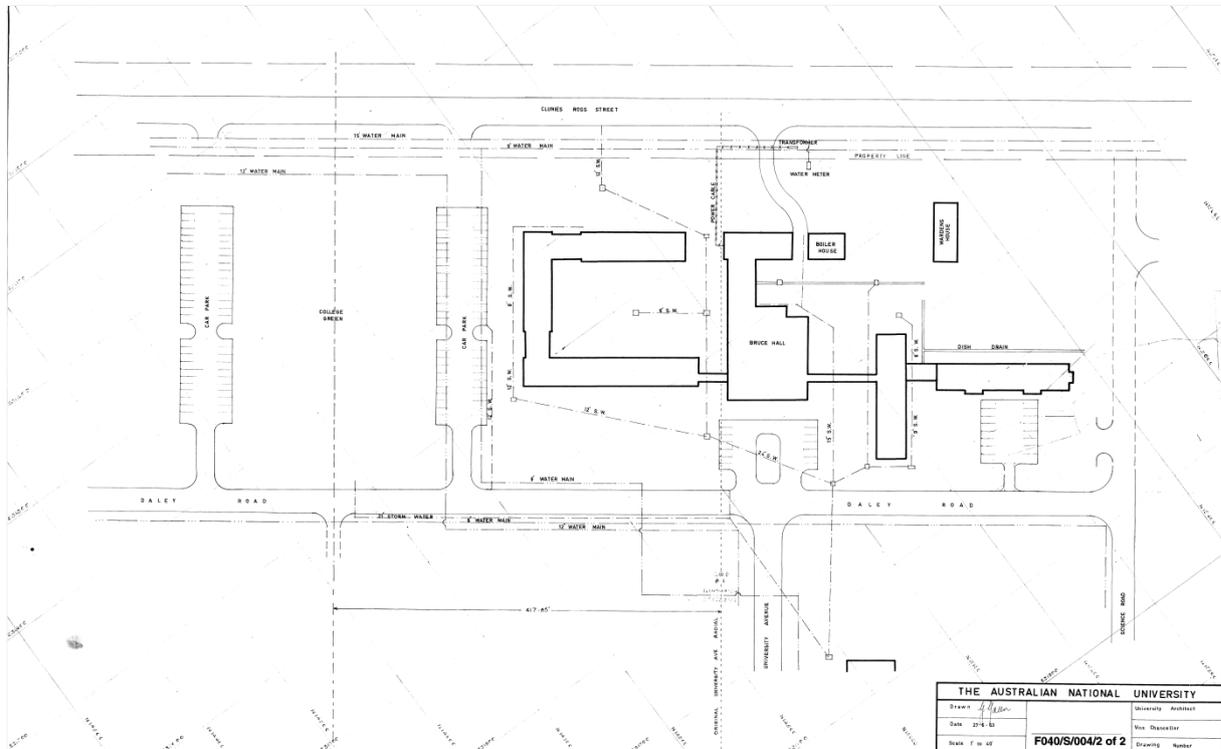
Site plan for Bruce Hall, including car parks along Daley Road. Drawn by the University Architect on June 26 1963. (Source: ANU Drawing Office)
